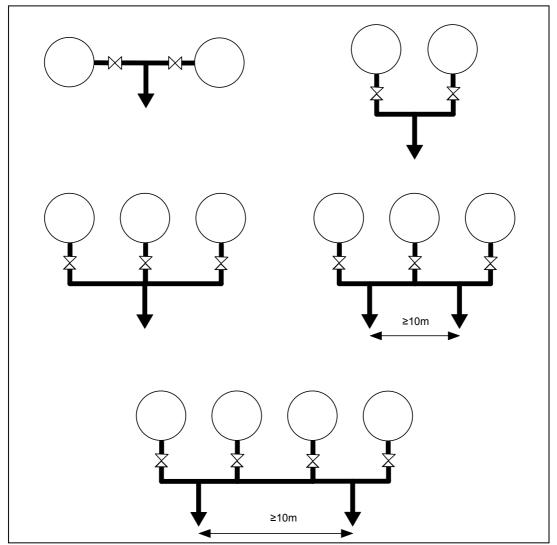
Acceptable tank connection arrangements for multiple storage tanks.
